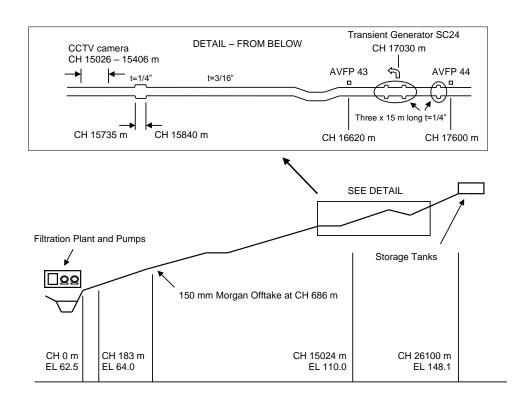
Morgan to Whyalla Pipeline Elevation and Detail along Test Length
